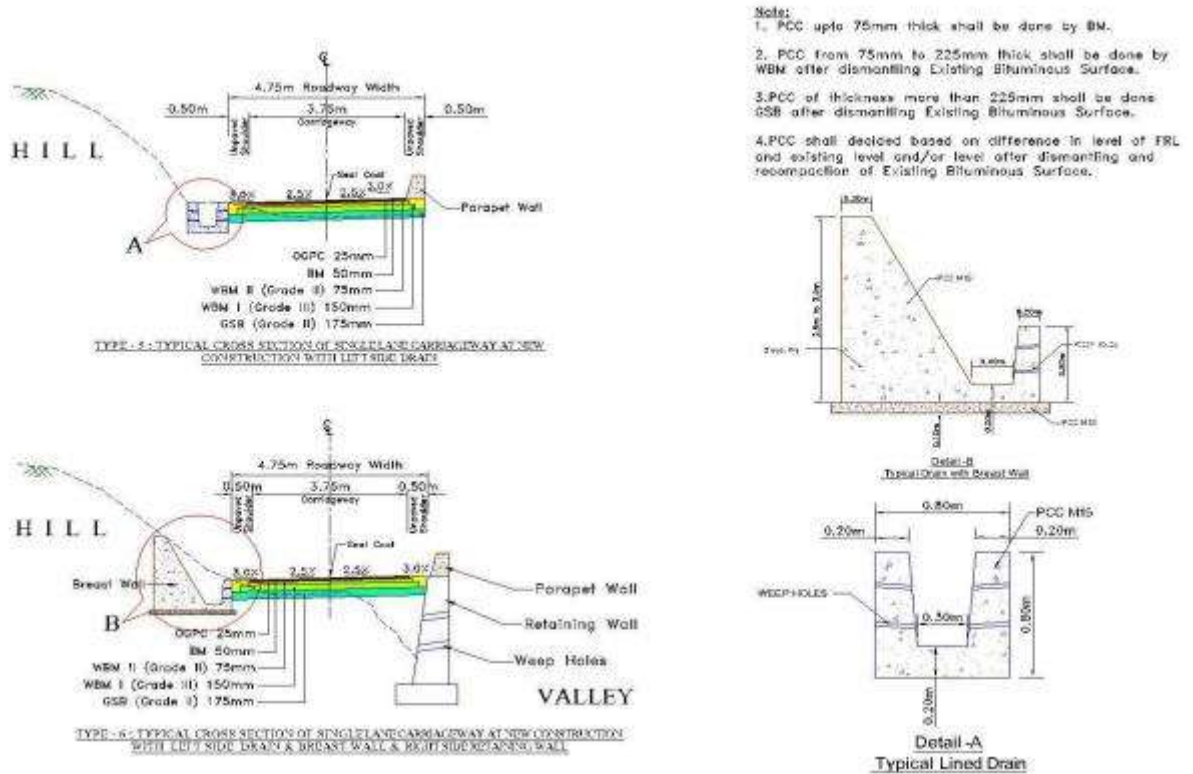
Typical Cross-Section of Single Lane Carriageway at New construction with Left Side Drain & Breast wall and Right Side Retaining Wall
